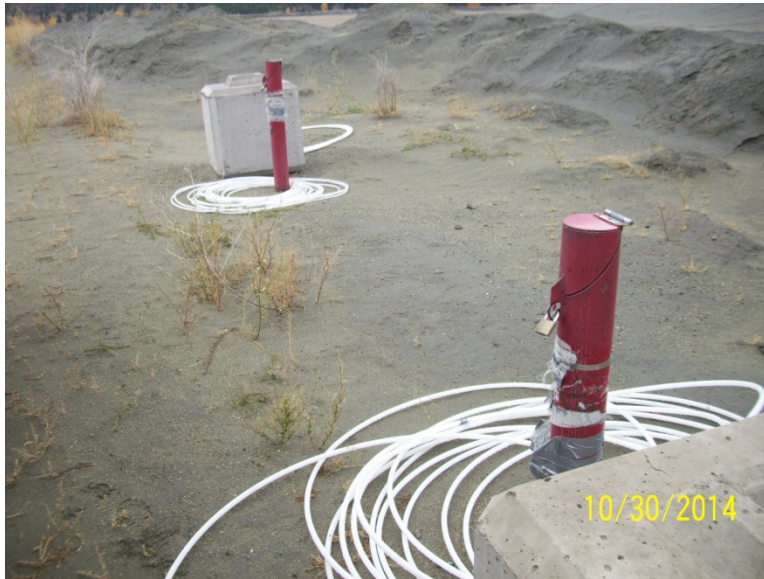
Upper Tailings Facility (Monitoring Wells MW-2 and -4)
